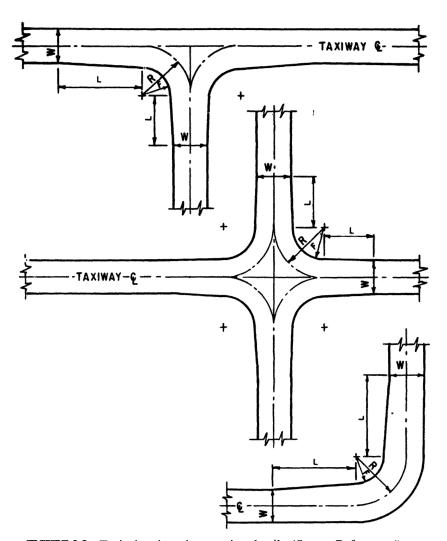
Typical taxiway intersection details. (Source: Reference 4)
